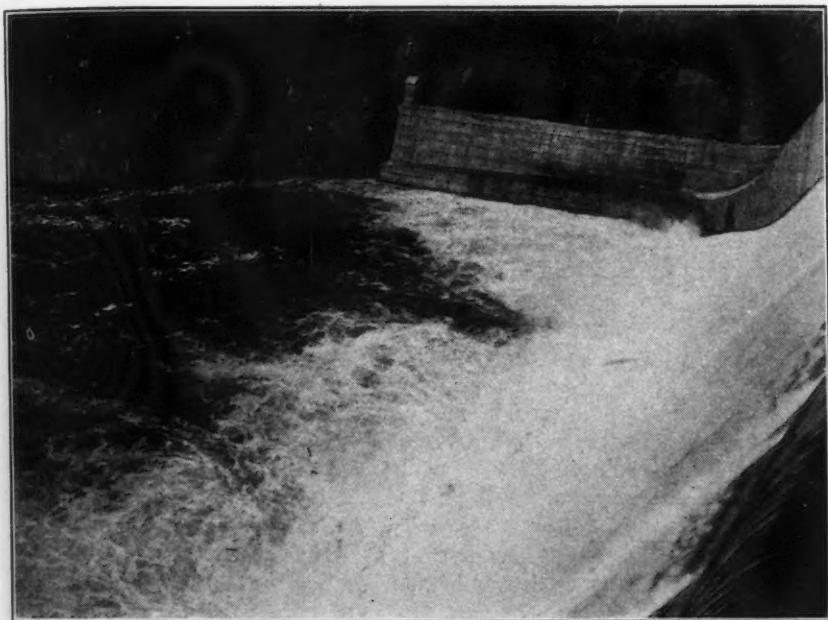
VIEW FROM SPILLWAY BRIDGE, SHOWING HYDRAULIC JUMP ON APRON;
